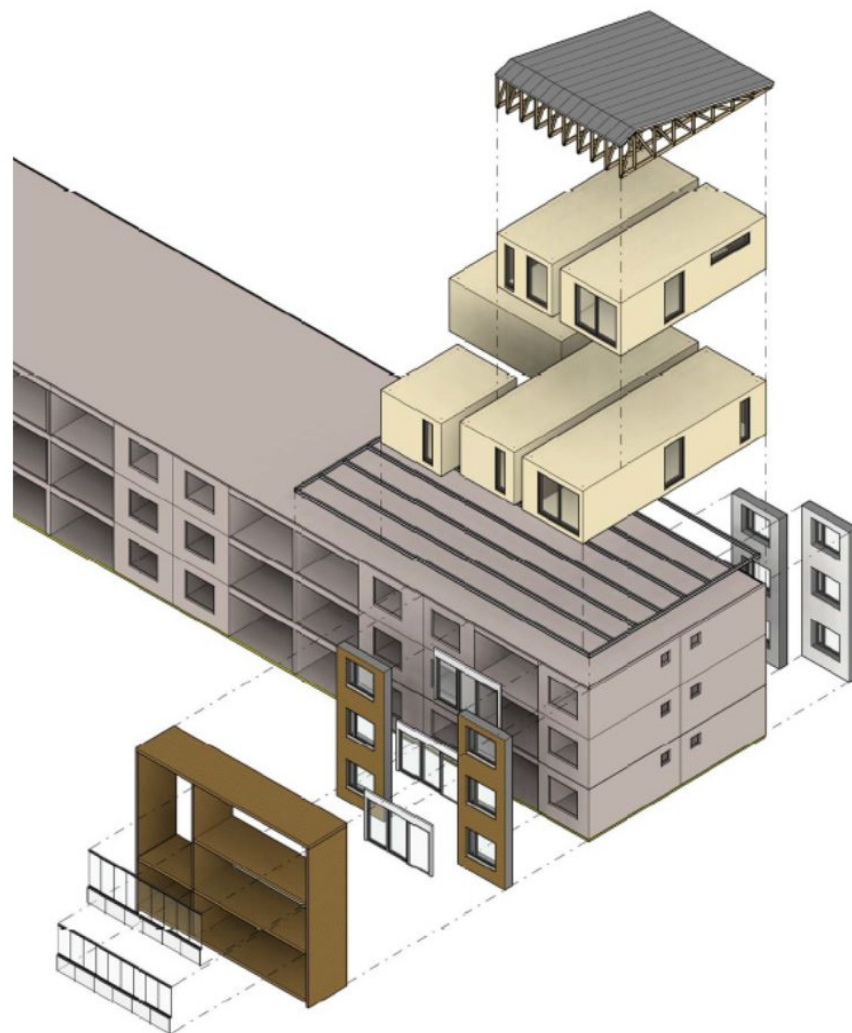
Additional floor project with wooden prefabricated units (Image courtesy of Simo Rasmussen).
